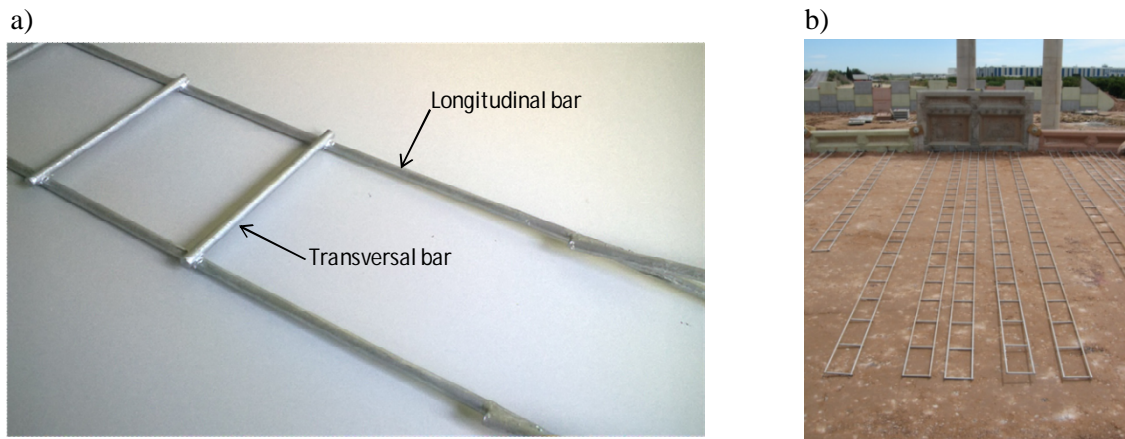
Steel ladder specimen detail (a) and on-site installation example (b).
